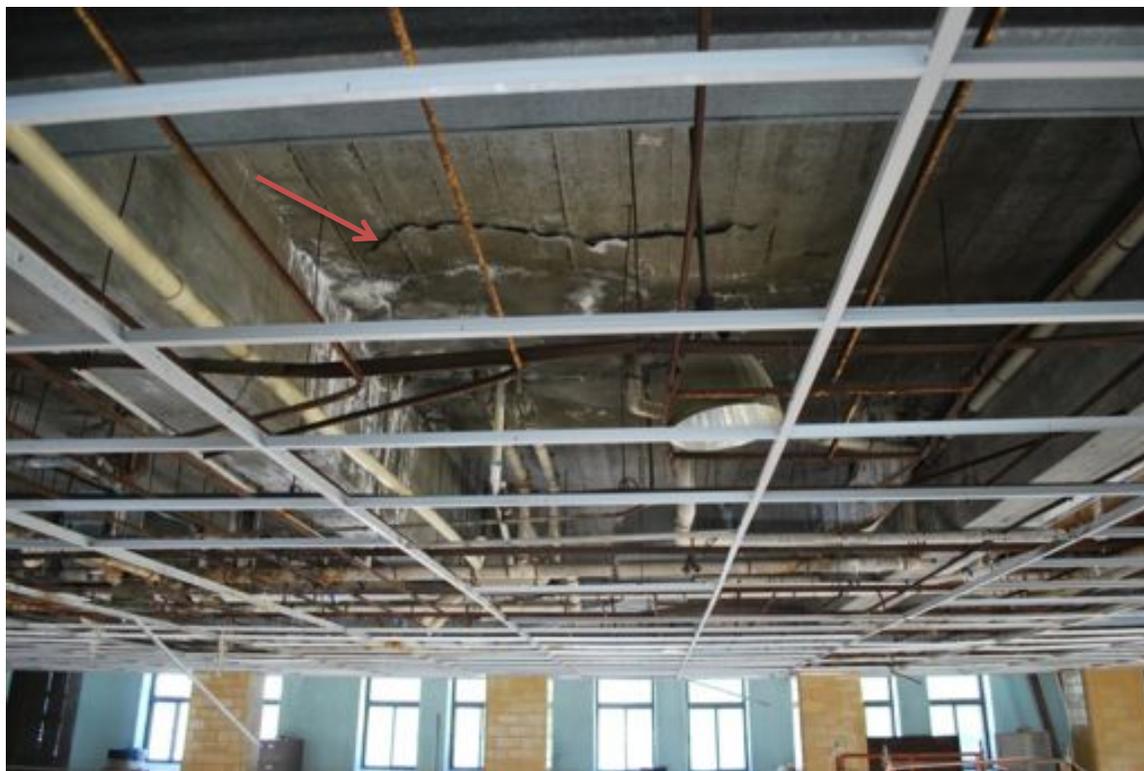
View of First Floor concrete slab delamination from the balcony at the Ground Mezzanine Floor level. (SRJA 2012)
